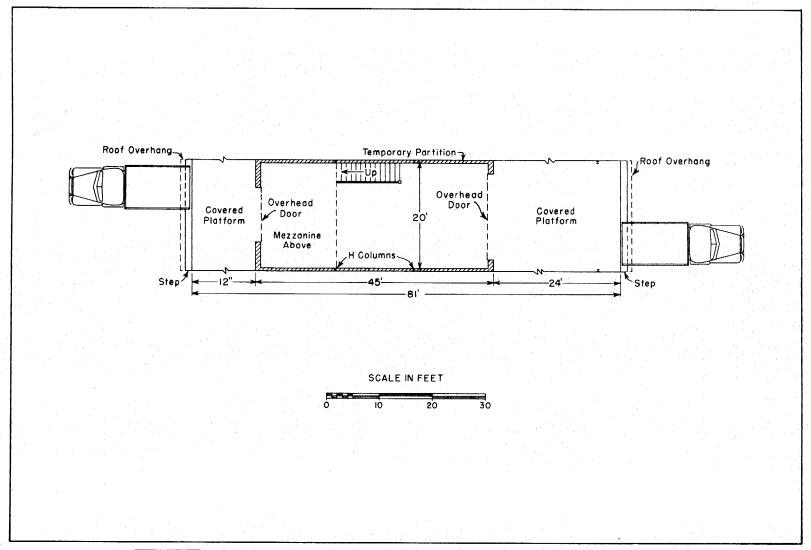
Suggested floor plan for a wholesale store, 20 by 45 feet.
